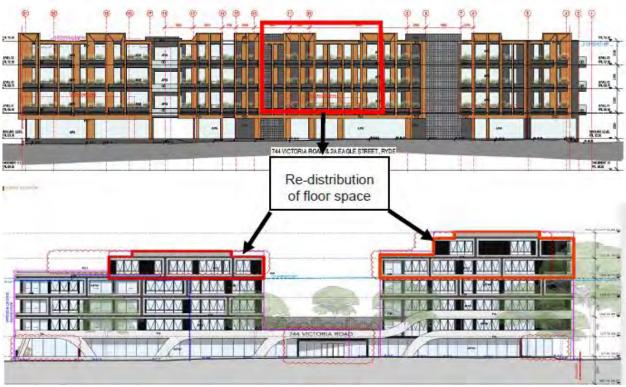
North Elevation comparison. Original plans (top) and amended (bottom)
